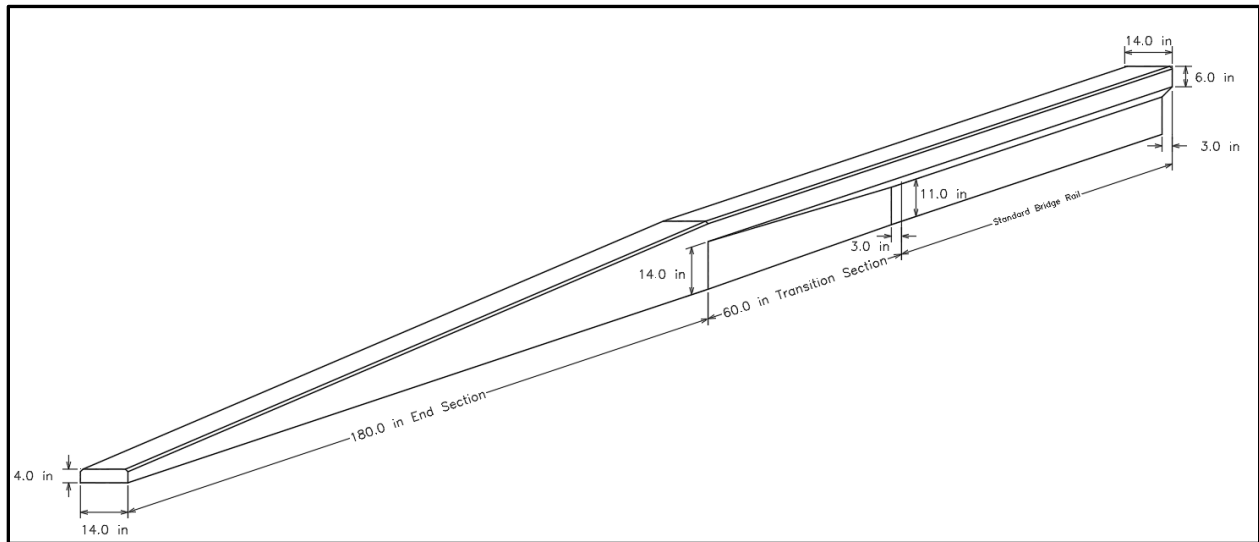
Original MPFP Bridge Rail with Sloped Concrete End Treatment [17]
